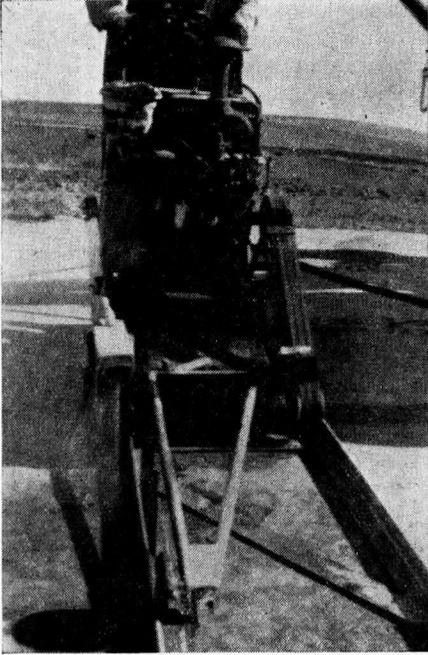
A Photo Showing the Saw Being Used and Guided by a Portable Light-Weight Guide for Straight Sawing
